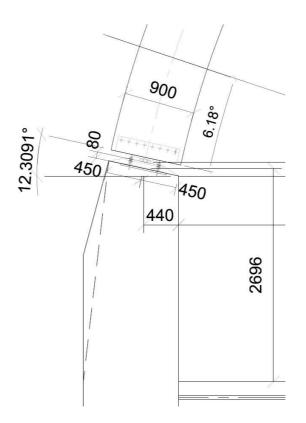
Detail of the foot base of the arch timber truss with foundation structure
